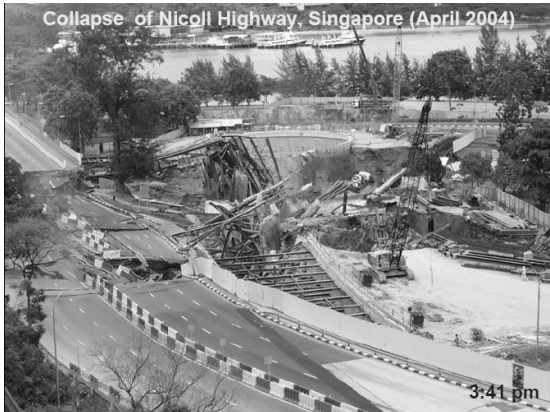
Collapse of the metro tunnel along Nicoll Highway, Singapore
